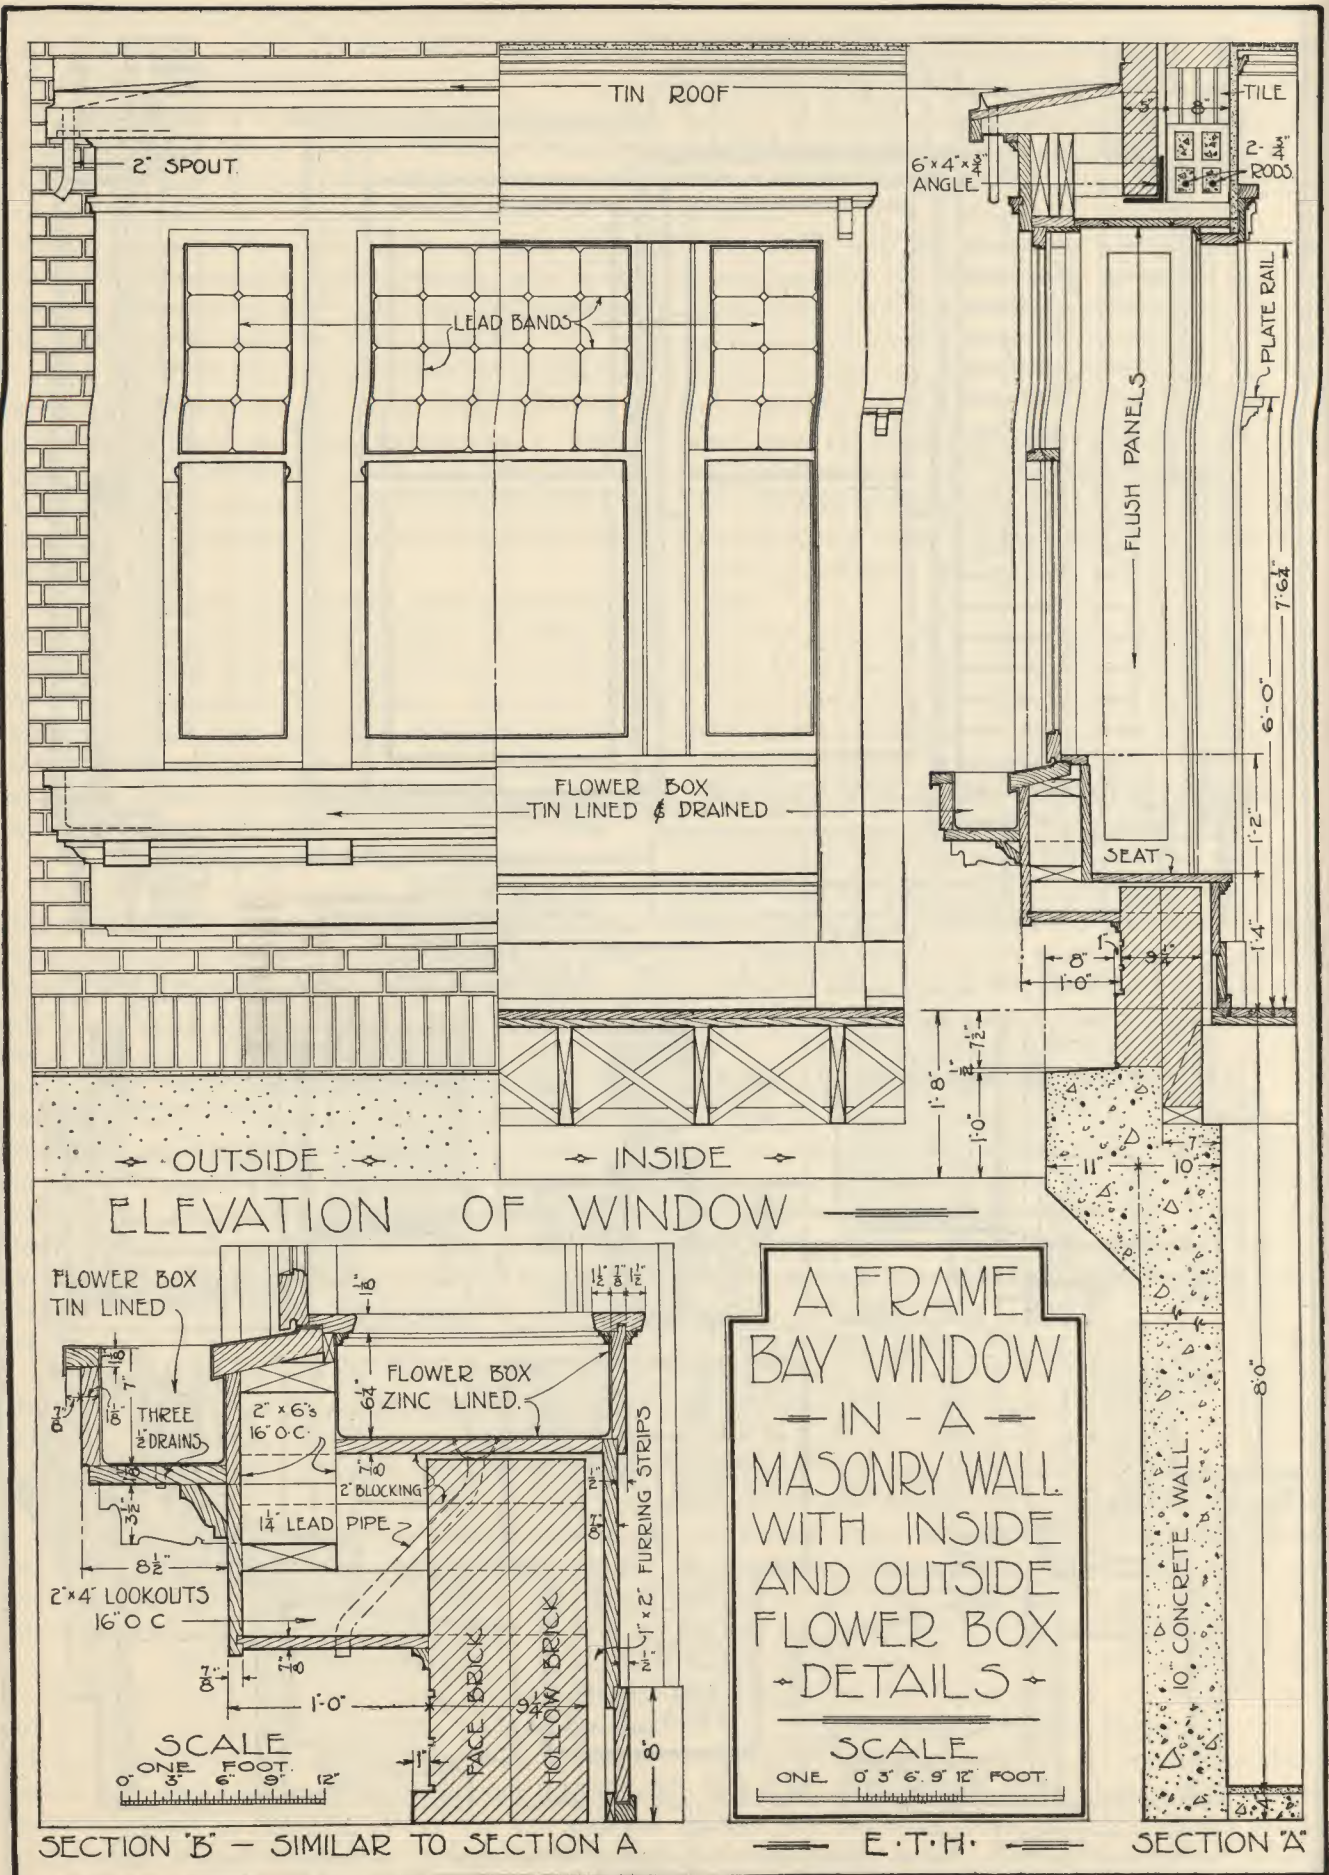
Plate XI. Details of a Frame Bay Window in a Masonry Wall.
